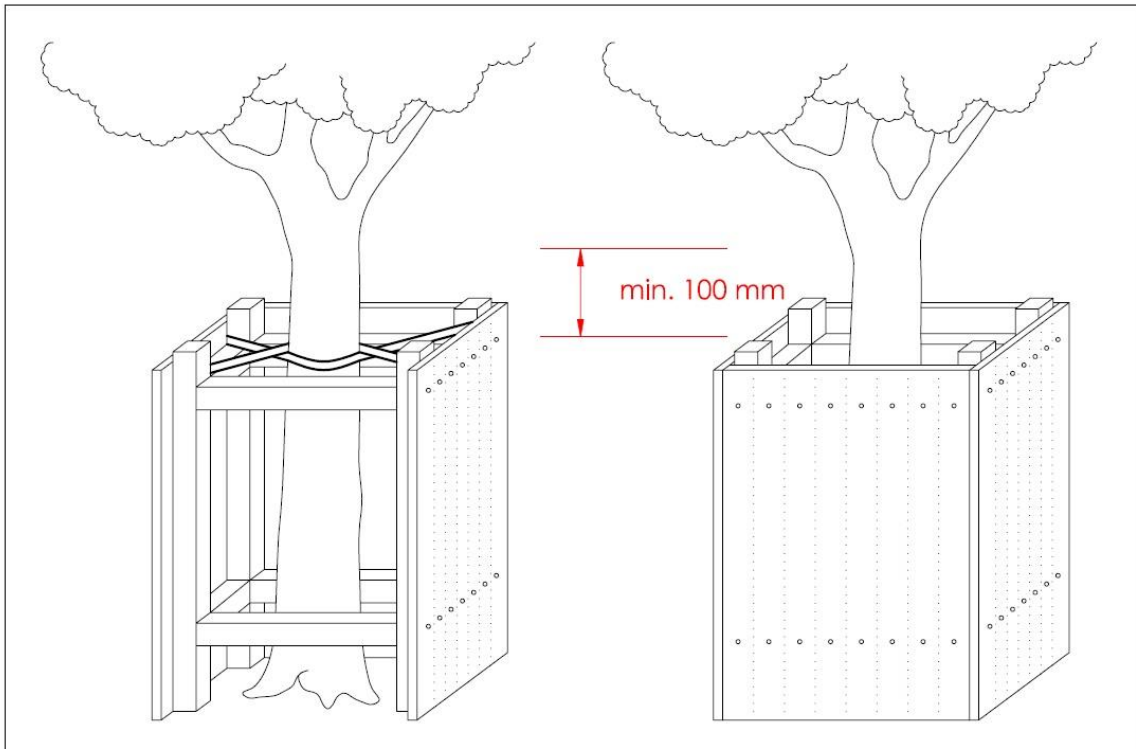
Trunk protection – model example 1 (4.2.4.1)
